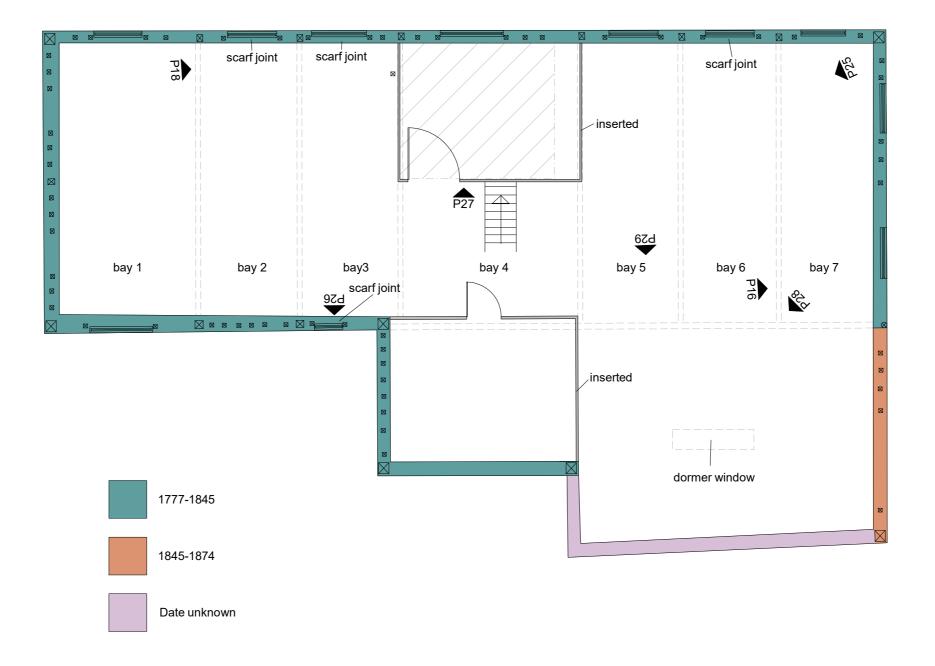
First floor plan. Location and direction of photographs reproduced in text shown.
